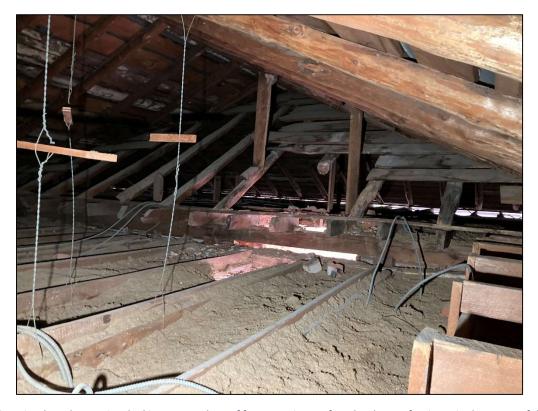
Attic, above log section, looking at rear slope of frame section roof. Hole where rafter is cut in the center of the image is where the stone chimney used to be. May 2023. Photo by the author.
